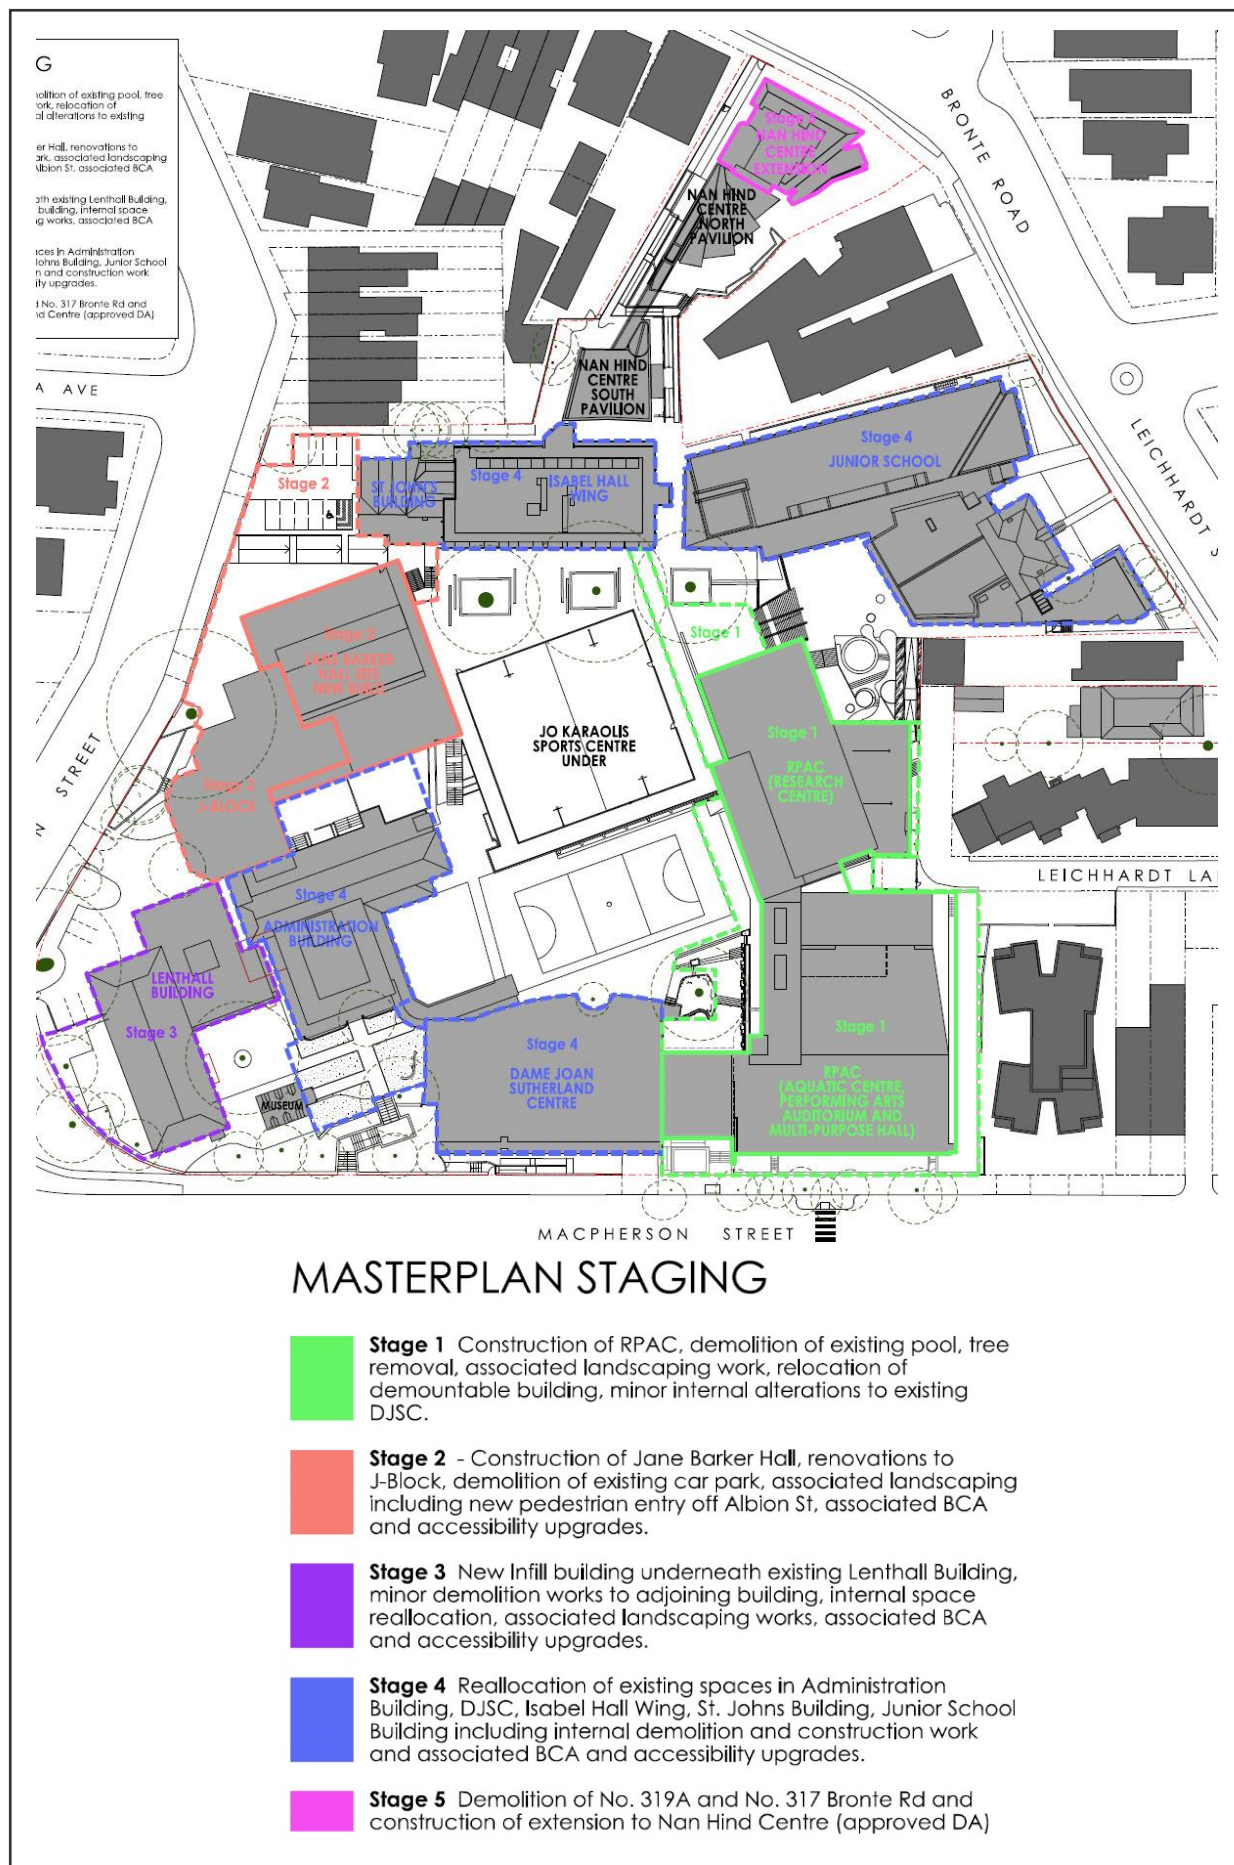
Original Approved Masterplan (Source: Applicant's Modification Application 2019)
